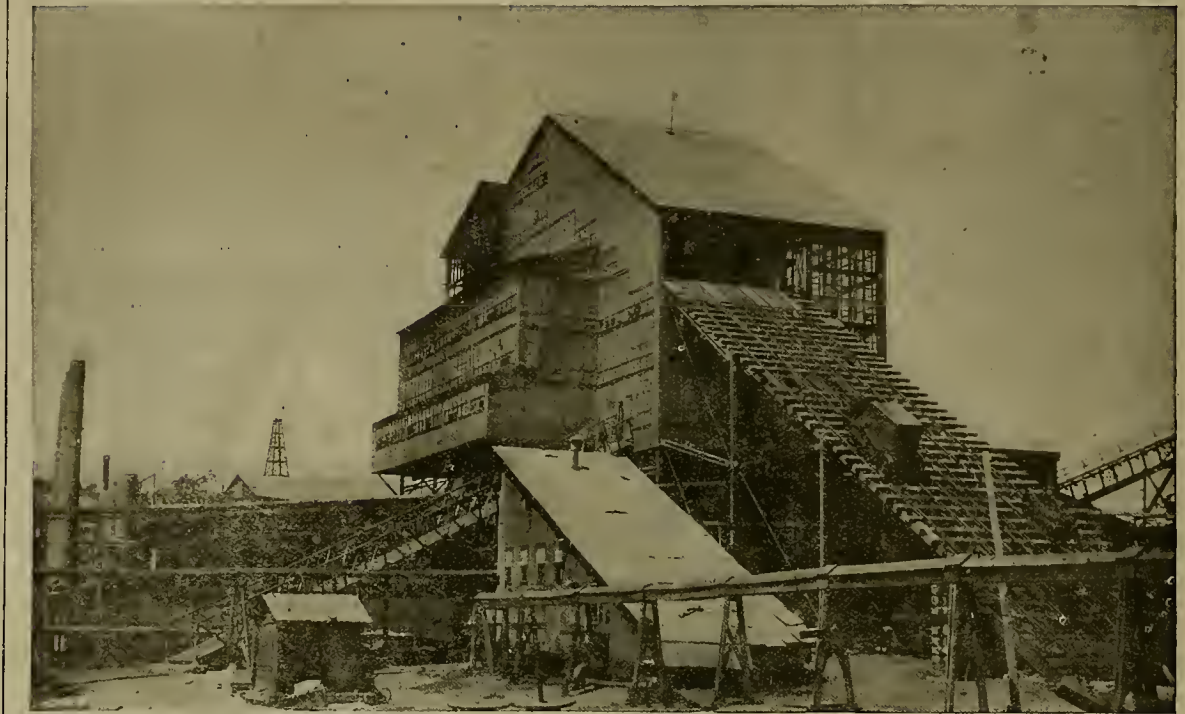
COMPLETED IRON BREAKER, FROM THE SOUTHWEST, SHOWING PLANE AND JIG-HOUSE.
